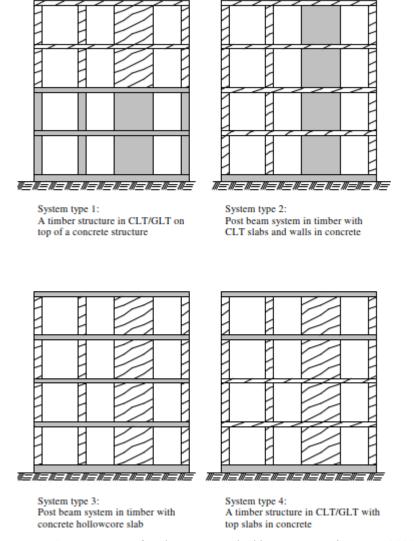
Four types of timber-concrete building systems (Larsson, 2023)
